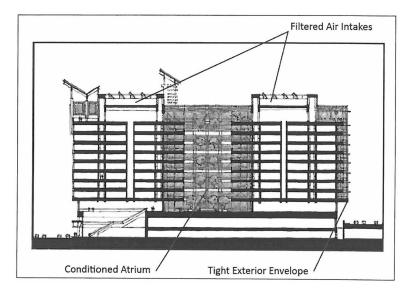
A proposed building design for the Chinatown site with two enclosed HVAC zones, joined in the middle by a plant-filled atrium *Credit: Giamportone Design
